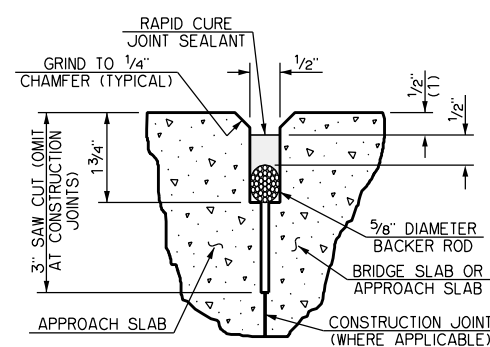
DETAIL OF APPROACH SLAB AT ABUTMENT WING
